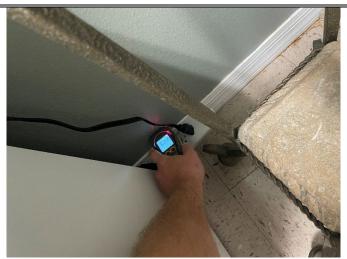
Elevated moisture was detected in the drywall below the break room window and rear wall.
